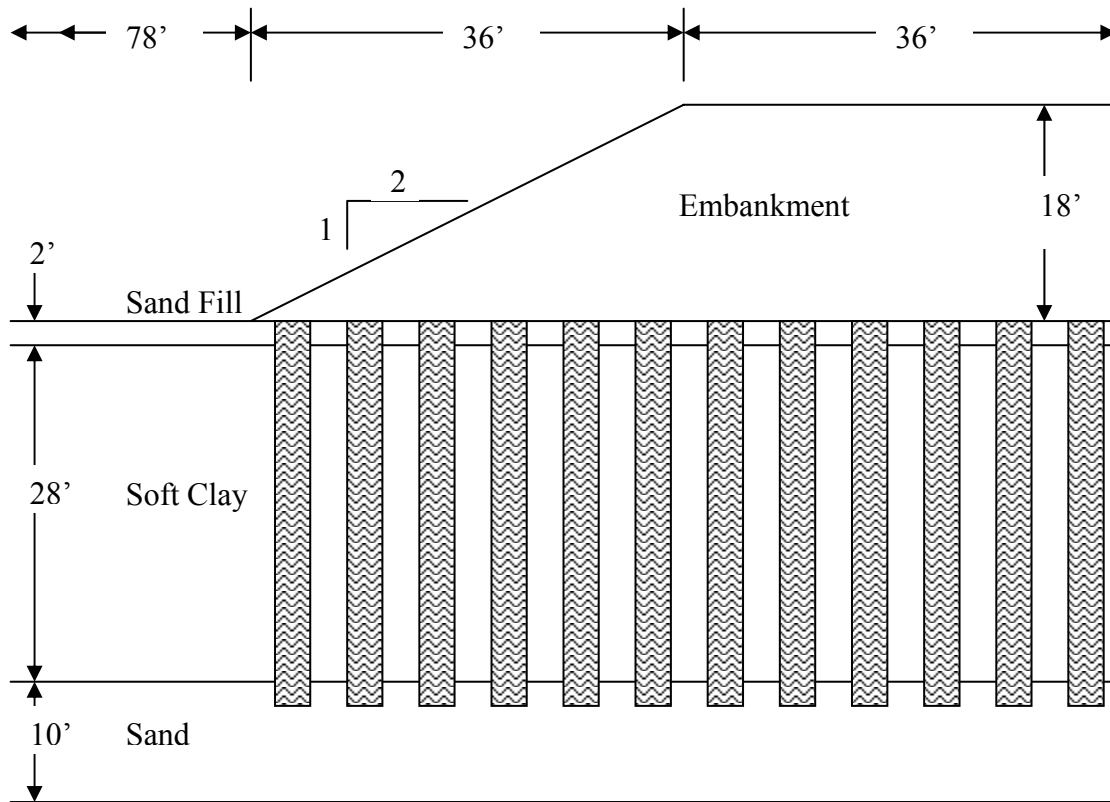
Profile of example deep-mixed, column-supported embankment
